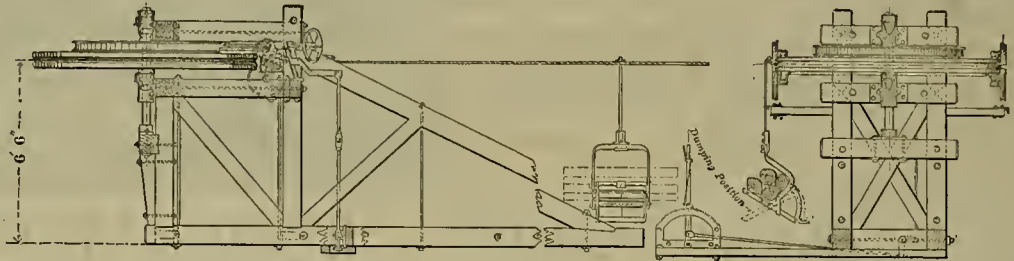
ELEVATIONS AND PLAN OF UPPER TERMINAL.
